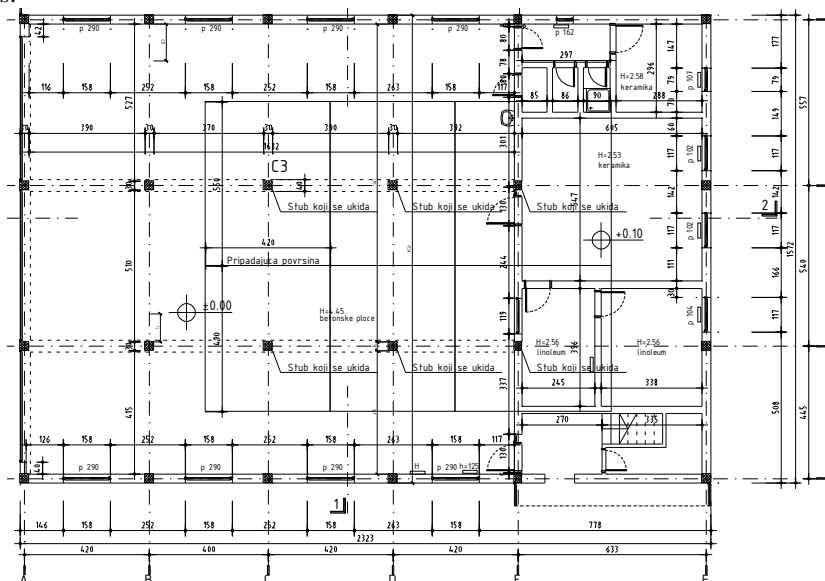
Ground floor plan columns that are removed (C2, D2, D3, C3, E2 and E3)
